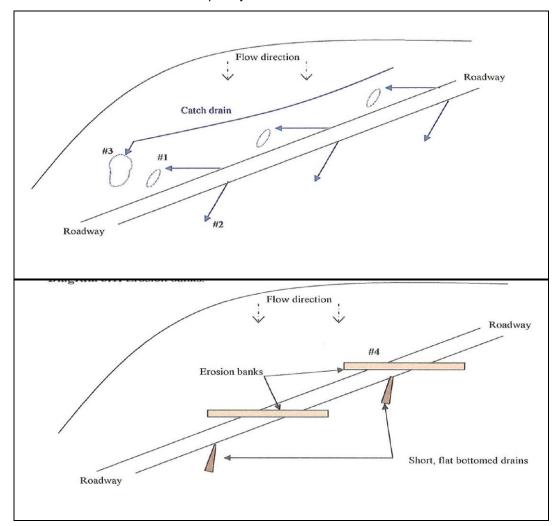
Desired construction method for temporary roadways associated with construction activities (plan view)
